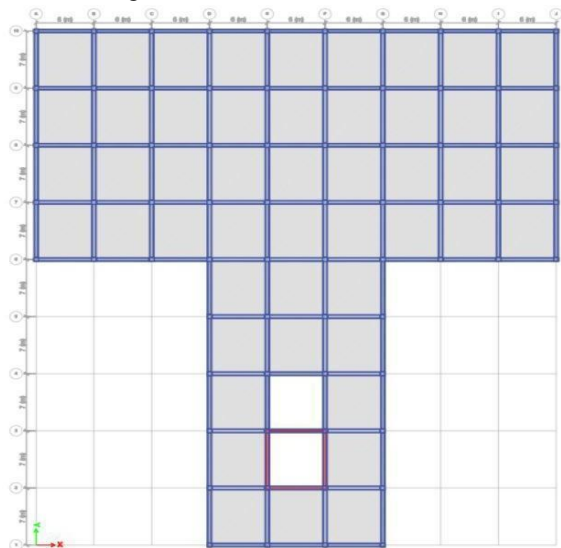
T-Shaped Floor Plan of the G+15 Building
